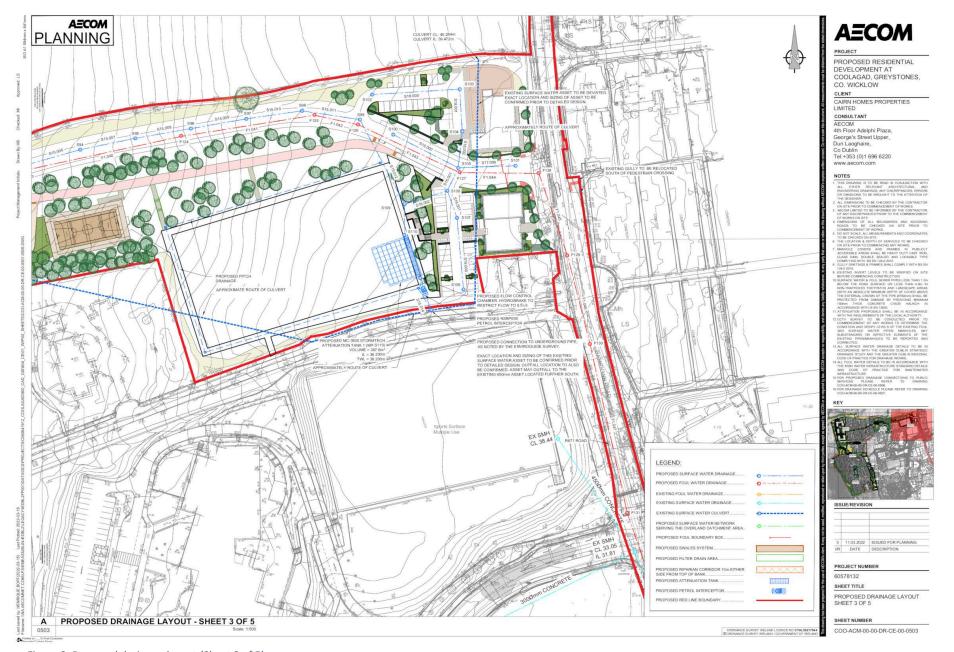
Proposed drainage layout (Sheet 3 of 5)
